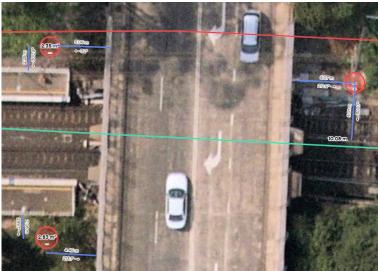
Portals' footings and structure city side city side of Station SW83+984 (Source: Marsupial Lion, provided 28 June 2022)
